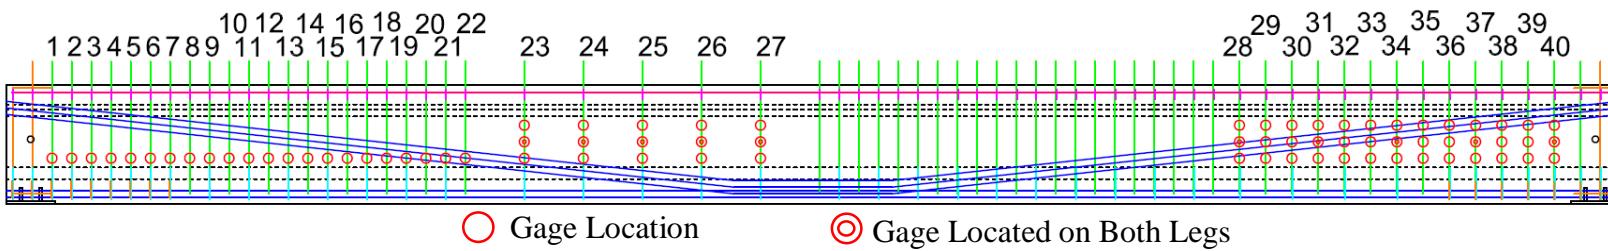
Elevation view of strain gage locations for the 36M prestressed concrete girder.
